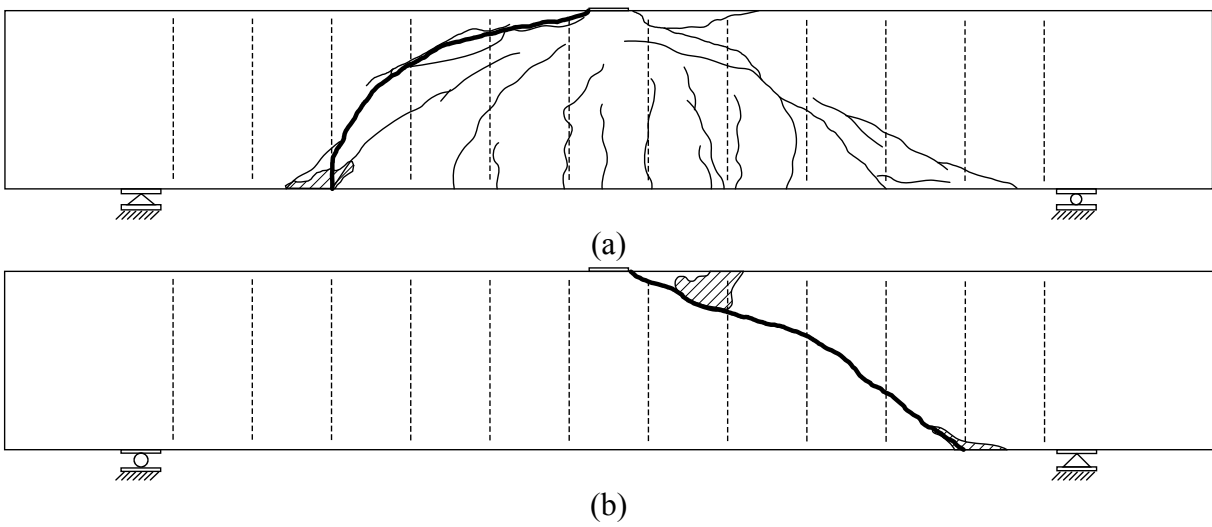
Observed damage in specimen P1S9, (a) front side, (b) back side
